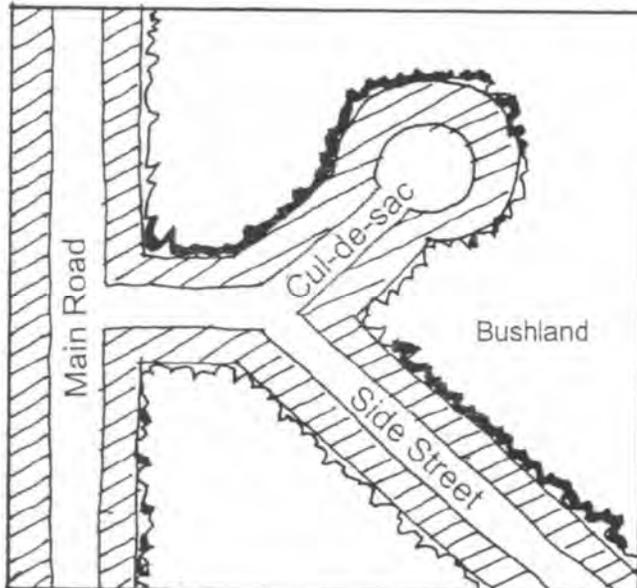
Unacceptable road layout in and adjoining bushfire hazard areas
